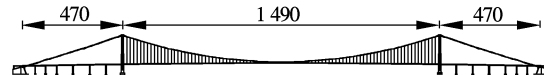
Configuration of Runyang Suspension Bridge (unit: m)
